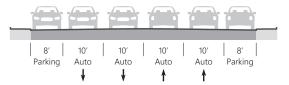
STATE STREET EXISTING CROSS SECTION
